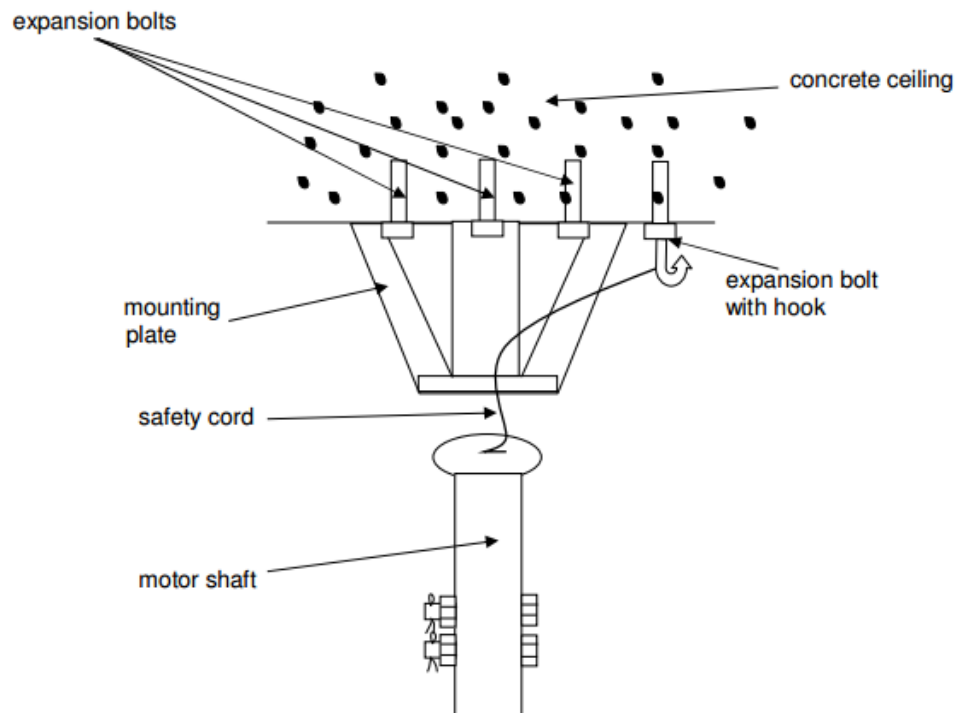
Showing The 3 Expansion Bolts, Safety Cord, Expansion Bolts with Hook and Mounting Plate of Ceiling Fan
